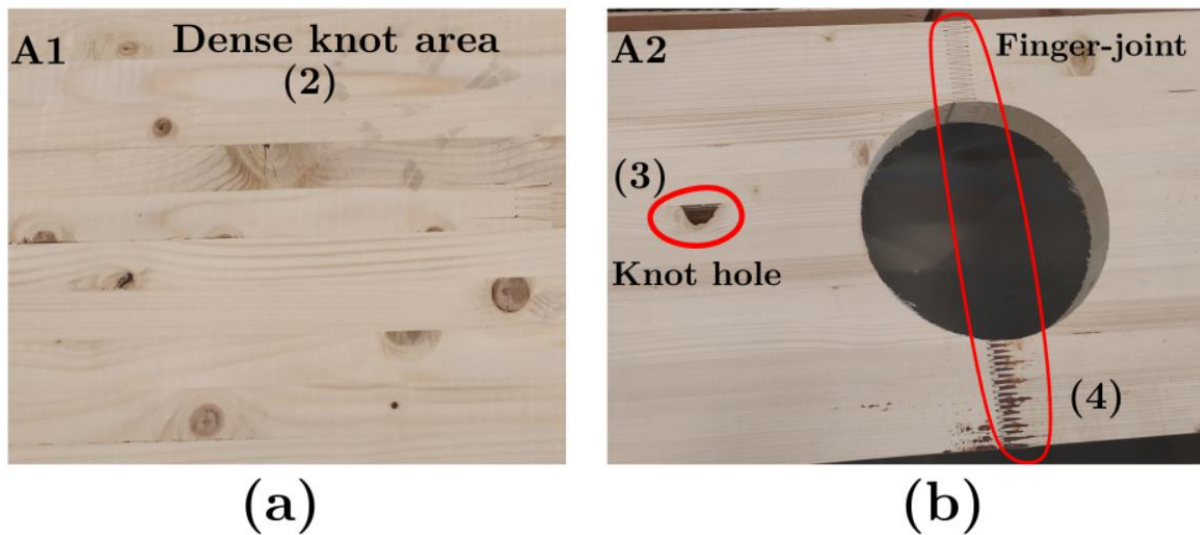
Photographs of (a) a dense knot area on specimen A1 and (b) a large knot hole on specimen A2 between the two holes.
